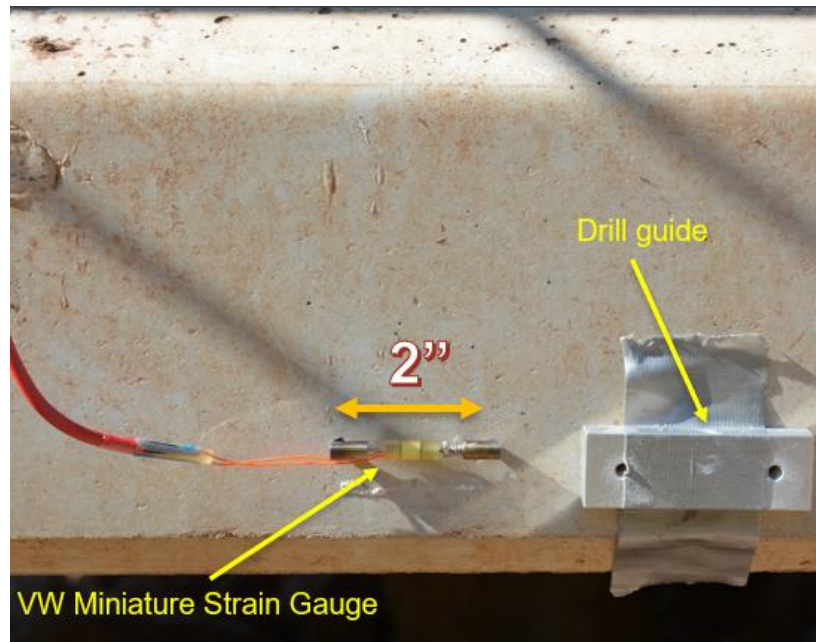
Miniature strain gauge next to the drill guide used for installation on the side of the bottom flange of the bridge girder
